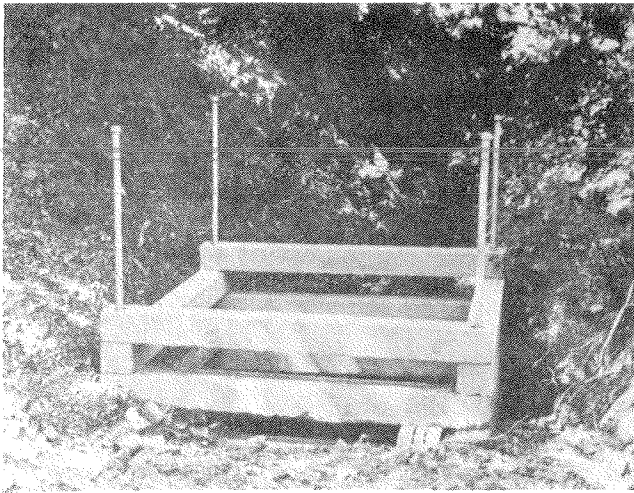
Debris crib of precast concrete sections and metal dowels. Height increased by extending dowels and adding more sections.
